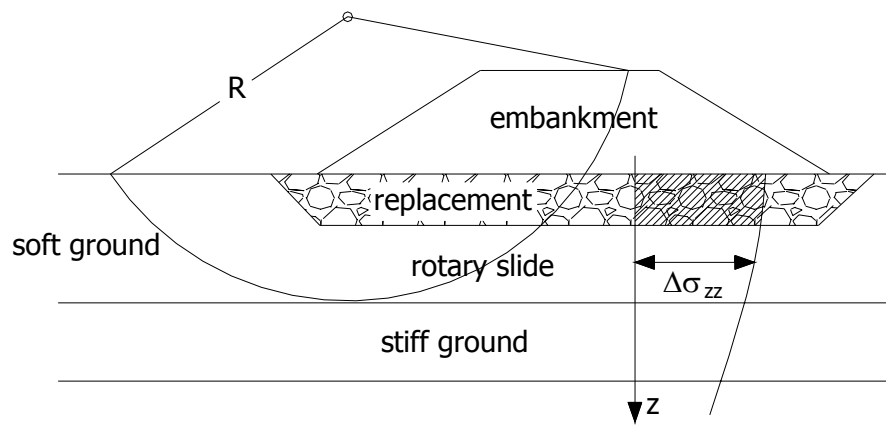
Example of embankment construction with partial replacement of soft ground below the embankment using stone material
